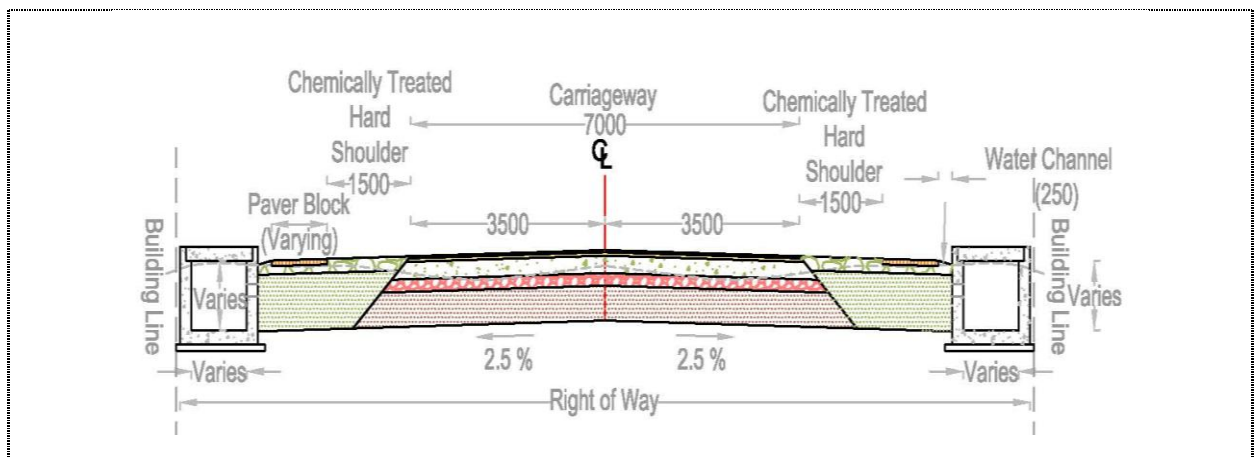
TCS for Project Road Section through Town on Ridge (TCS V)
